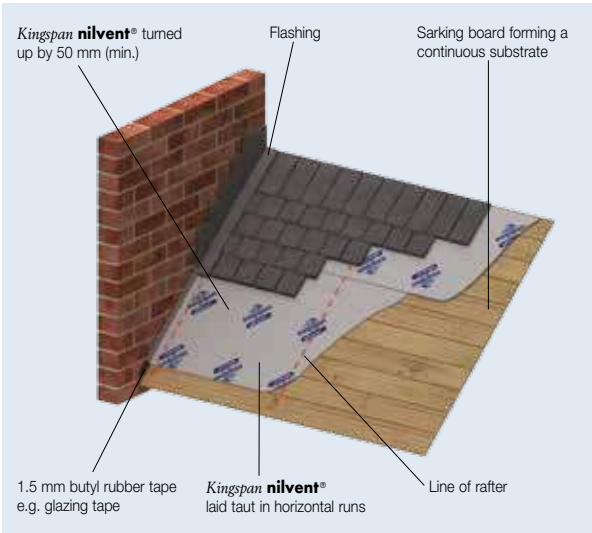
Abutments – Fully Supported Horizontal Installation with Natural Slates
